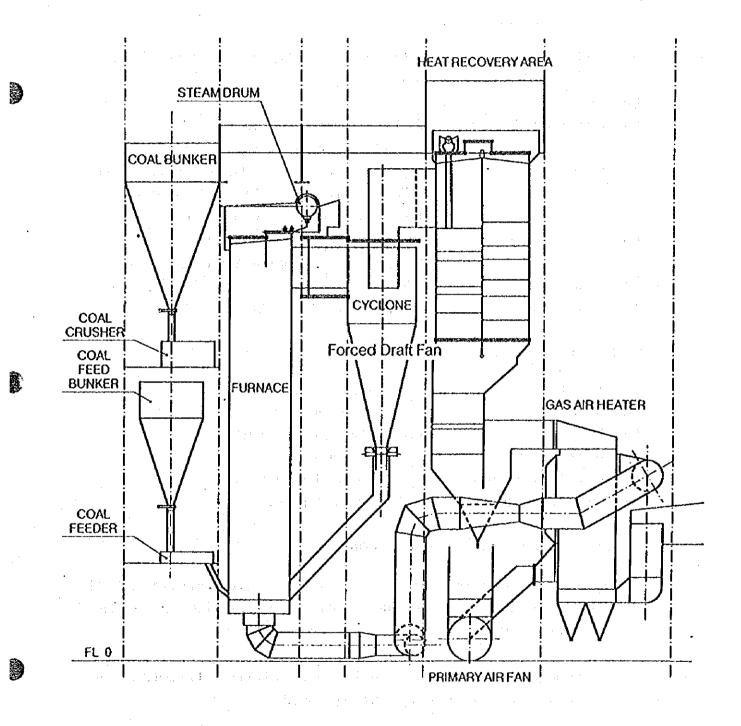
SIDE VIEW OF C-FBC BOILER PLANT
